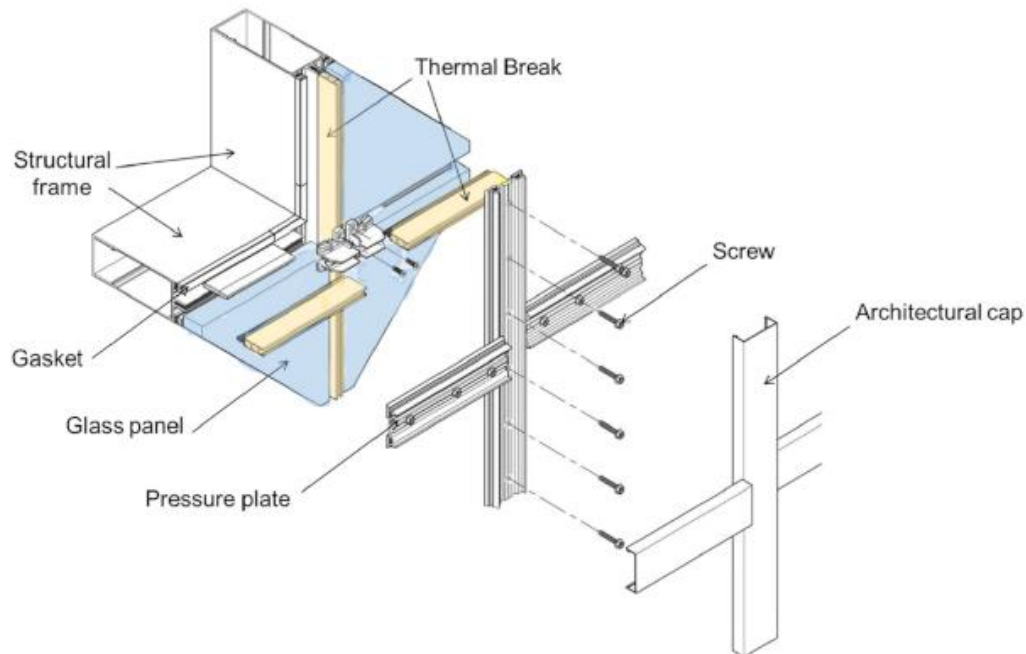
30. Exploded view of the stick-system curtain wall façade.
